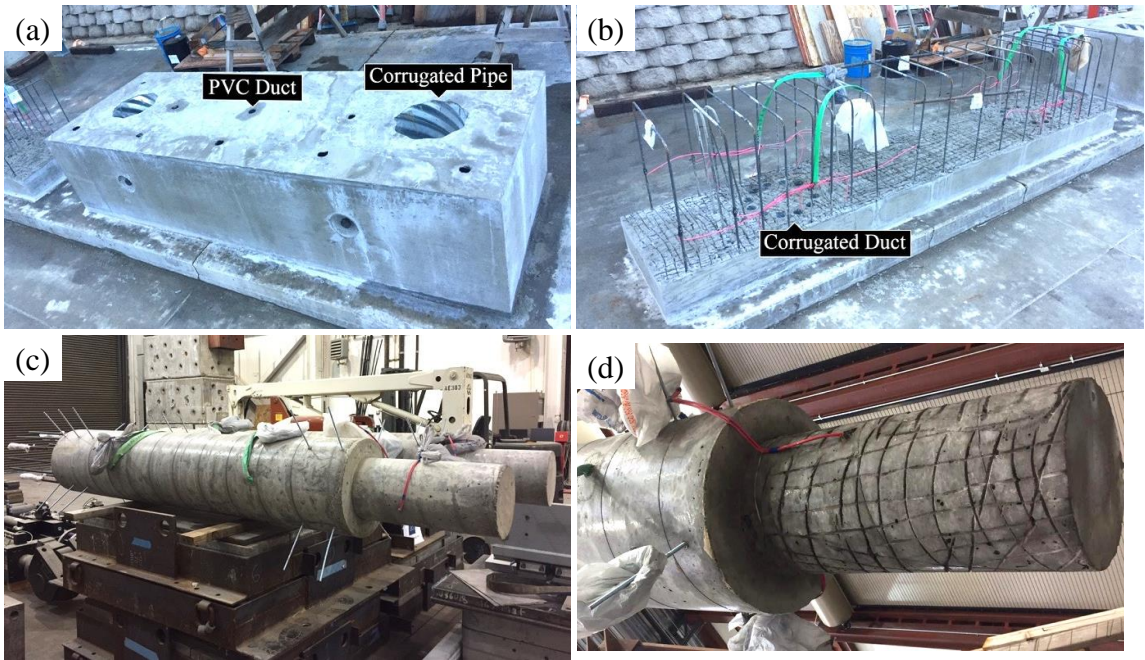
Prefabricated elements of the bent (a) Precast footing with two circular pockets, (b) Precast cap beam with corrugated ducts, (c) Column, (d) Roughened surface of rebar hinge (Images by Elmira Shoushtari)
